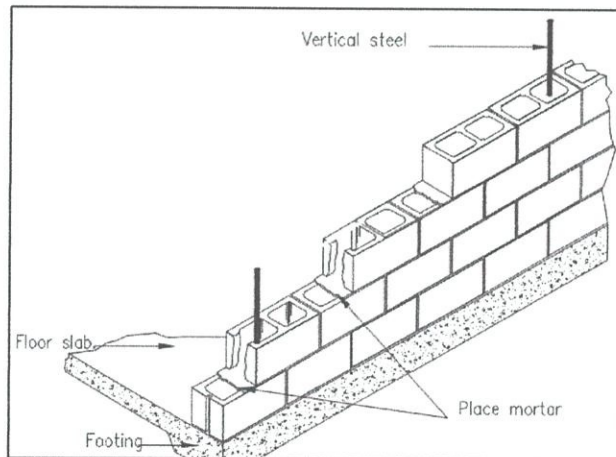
Starter Bar at the End of the Wall
